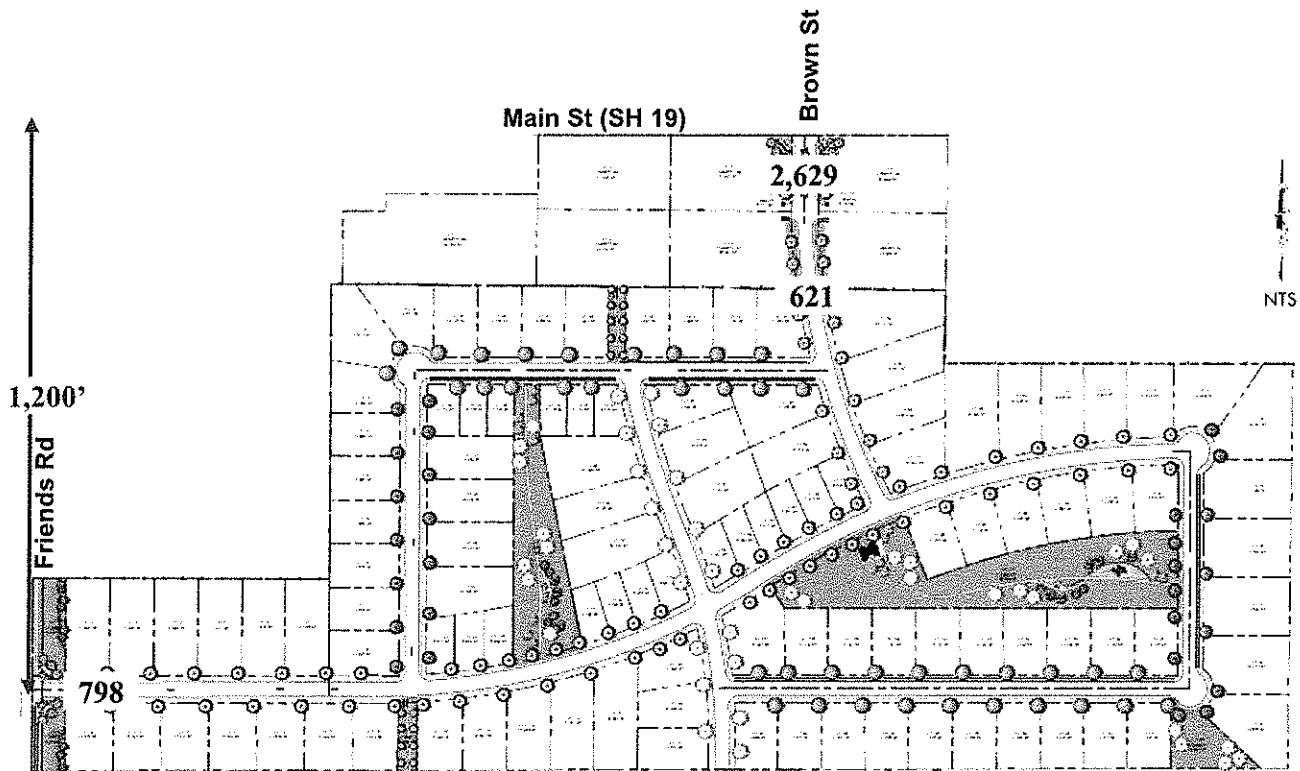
shows the site access location and internal circulation. Royal Ridge Subdivision is proposing to construct one full-movement approach on Friends Road located approximately 1,200 feet south of Main Street. In addition, the development is proposing one full-movement approach on Main Street aligning with Brown Street to the north. Field review was conducted at both proposed site access locations. Field review photos are included in the appendix. Adequate sight distance was confirmed in excess of 390 feet for the posted 35-mph speed limits on Main Street and Friends Road north of the access and in excess of 550 feet for the West Access looking south for the posted 50-mph speed limit on Friends Road south of the access.
